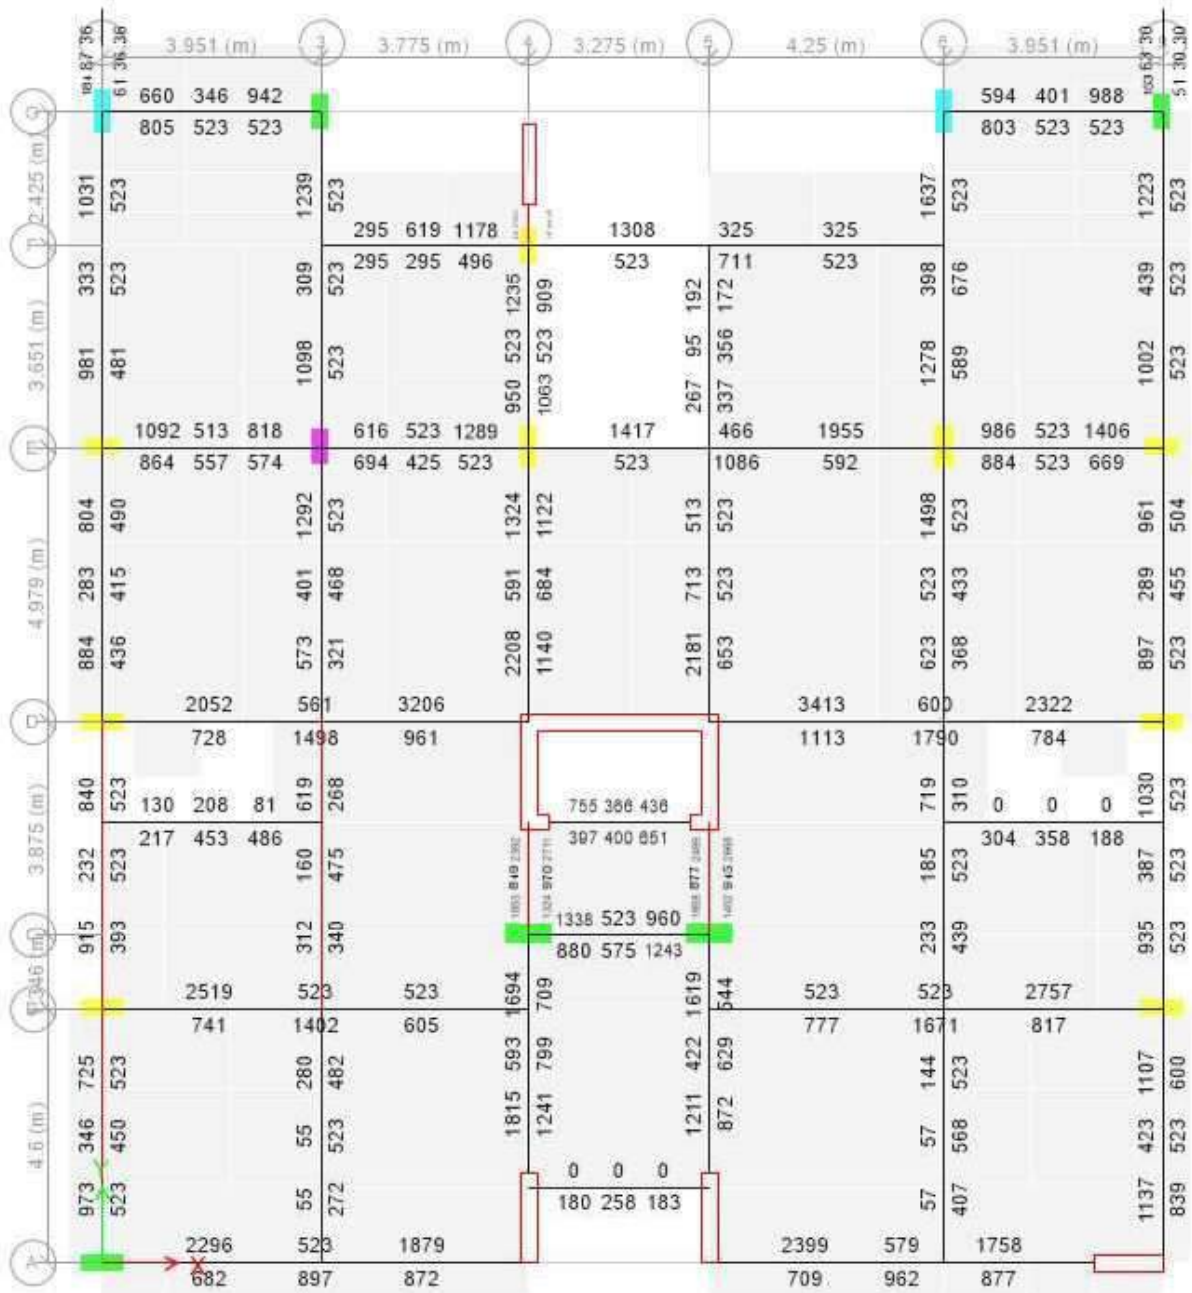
Reinforcement of 5th & 6th Floor Beam (mm²)
